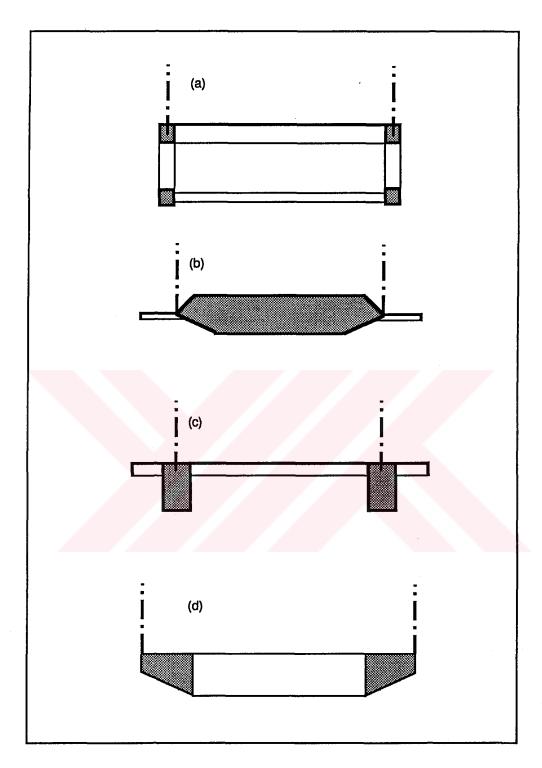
TYPES OF STIFFENING GIRDER SECTIONS ALLOWING A DIRECT CONNECTION TO THE CABLES
